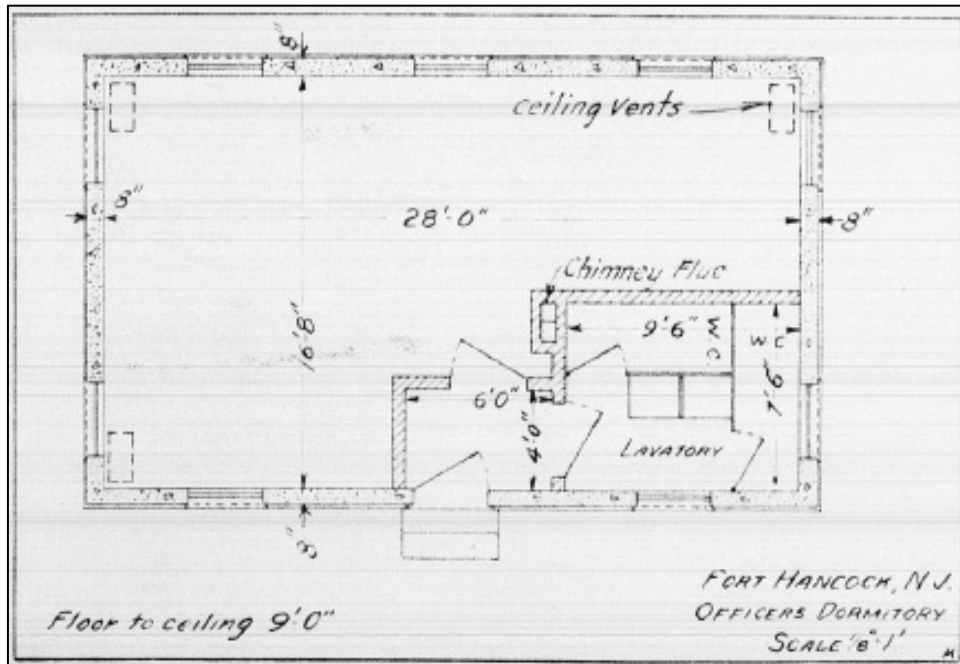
Plan of officers' dormitory built west of Battery Potter, July 1, 1921.
